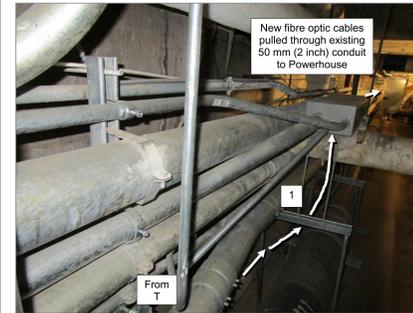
Location U, conduit connecting into existing junction box JB-D
